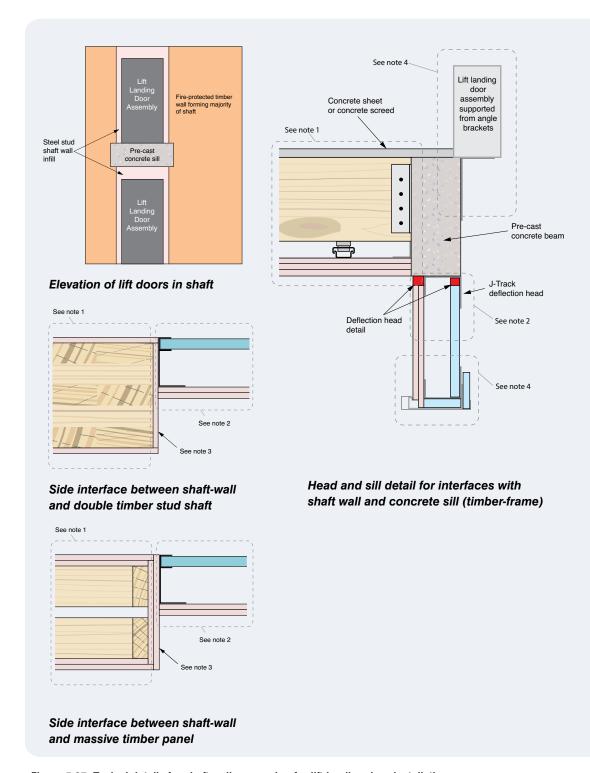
Typical details for shaft wall conversion for lift-landing door installation.
